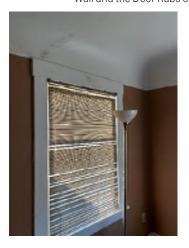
Sheetrock Cracks in the Ceiling and Walls.
